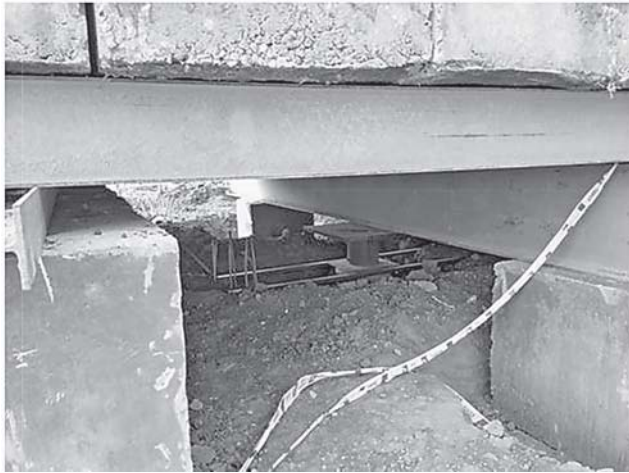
Pile load test arrangements girders seat on 1-meter cube concrete blocks.
